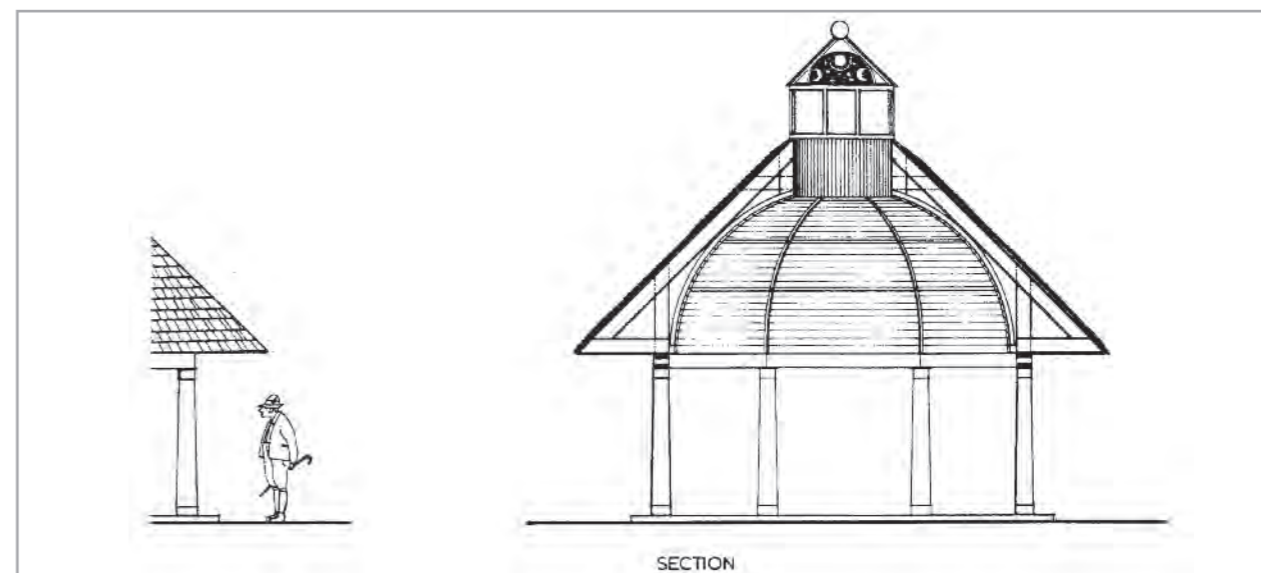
Irish timber pavilion in St. Stephens Green, Dublin.
